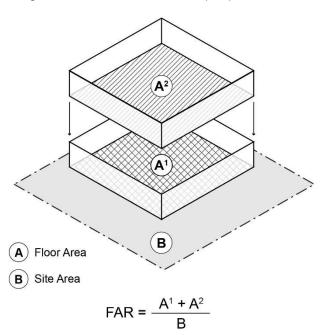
a. Floor Area Ratio (FAR) Calculation
